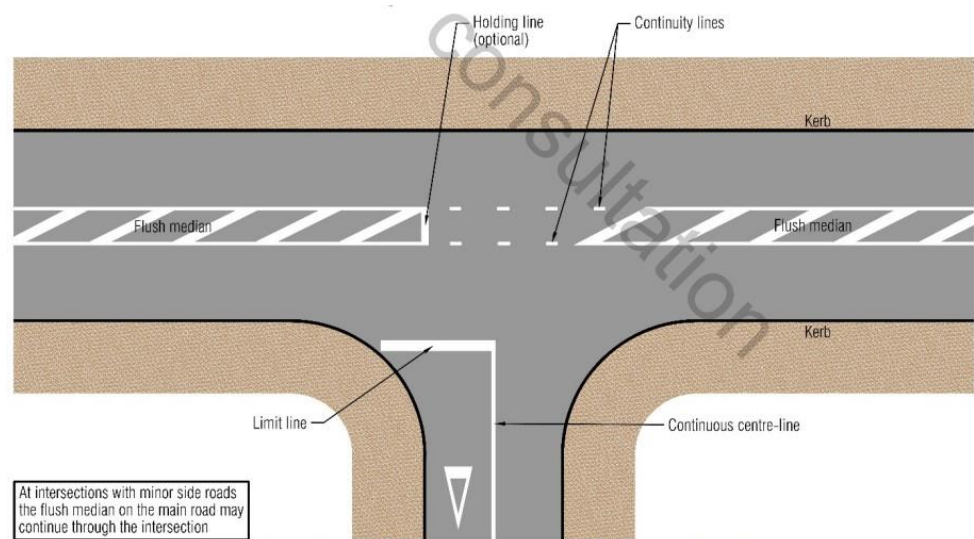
Proposed Minor (Southern) Intersection on Arnold Valley Road
